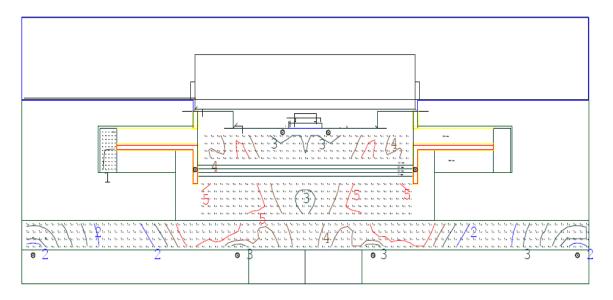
East Entry and Façade – Plan of AGI Model with Footcandle Isolines
